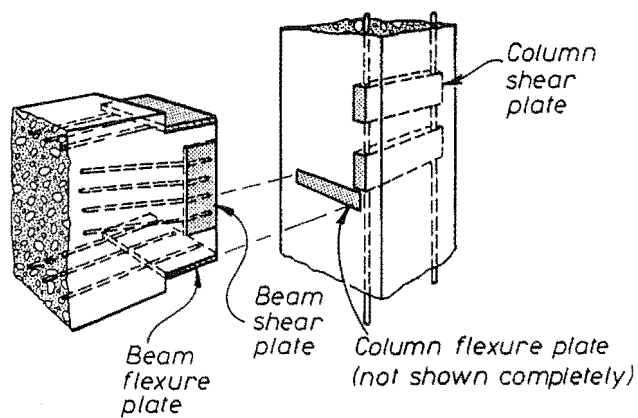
Connection Detail Tested by Seckin and Fu (1990).
